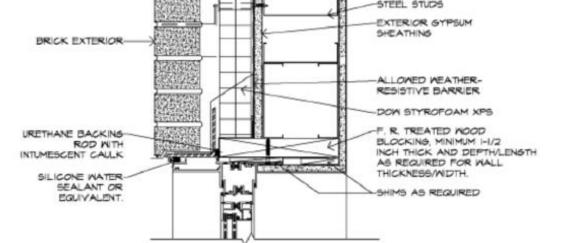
WINDOW HEAD DETAIL-FRTW WOOD BLOCKING-FRAMED WALL
